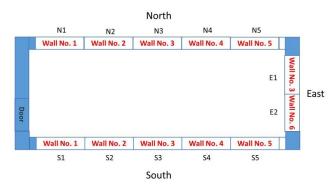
Layout of 12 Test Wall Panels, in Six Wall Assemblies and Three Orientations at the Test Hut
